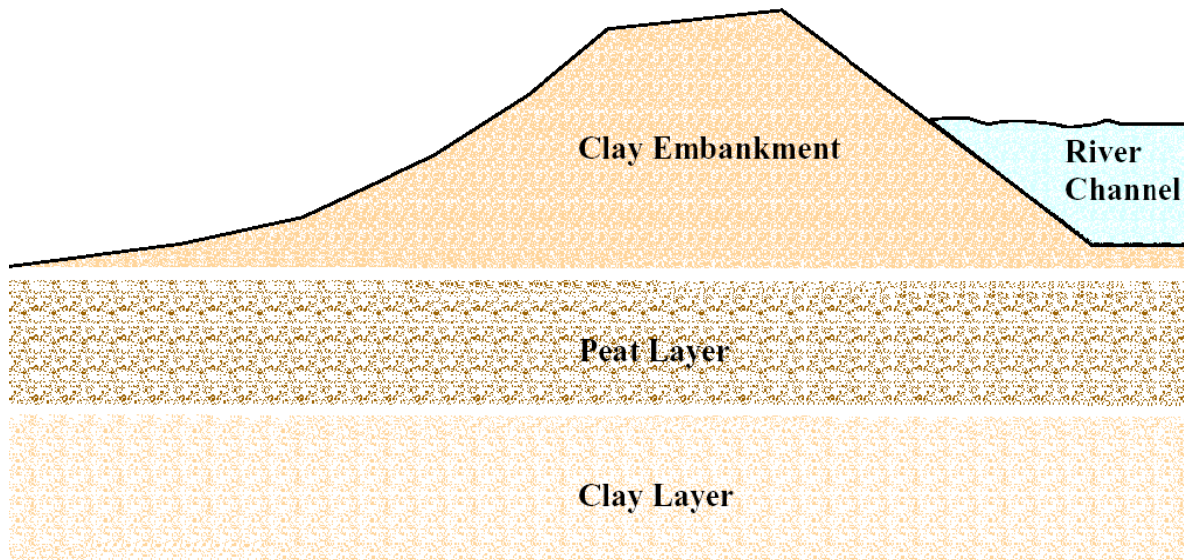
Existing Soil Profile under the Flood Embankment (Simm et al. 2004)
